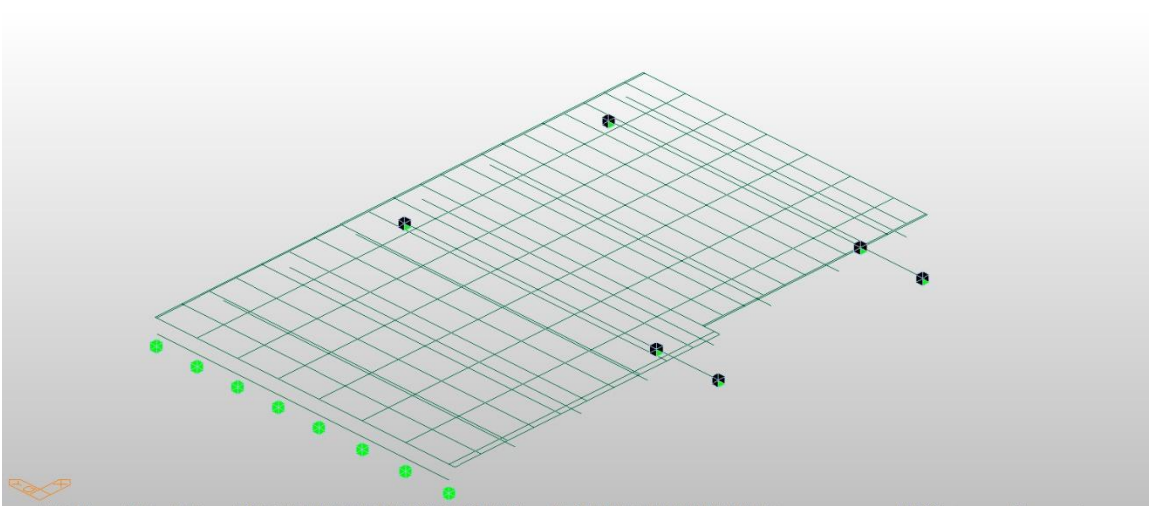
Approach and Tower support conditions for 225mm Concrete and 90mm Asphalt (Similar to North Tower)
